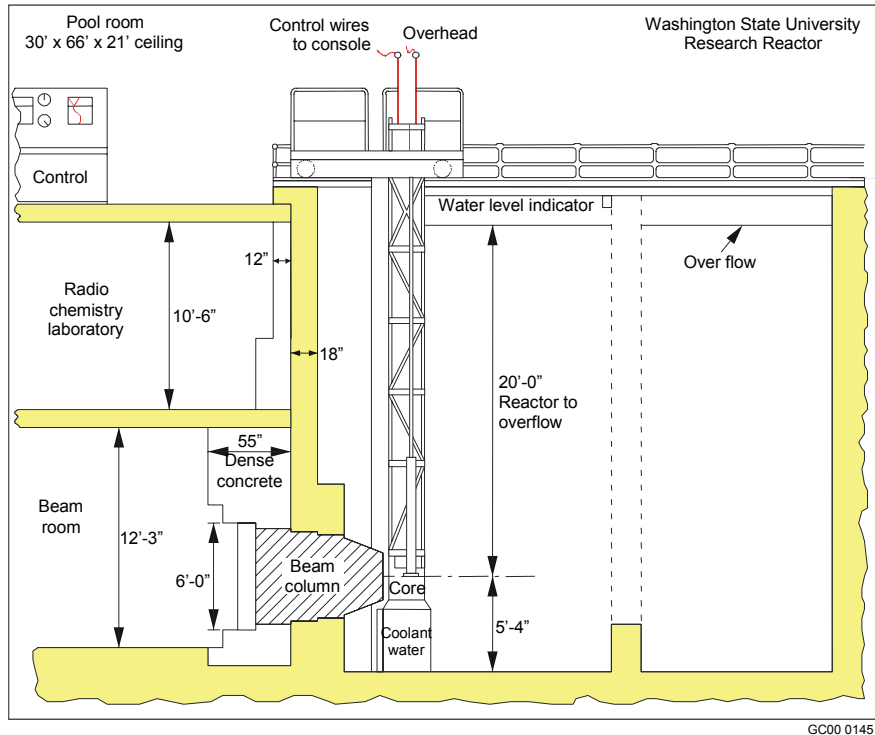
Elevation plan of the WSU TRIGA reactor facility.
